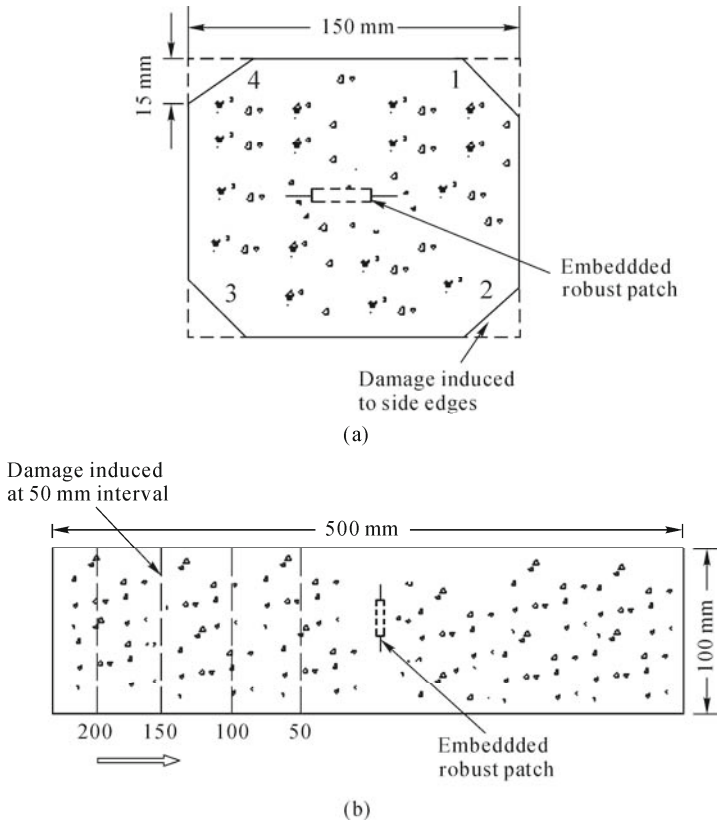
Plan view of two damage types. (a) D1 in cube; (b) D2 in beam
